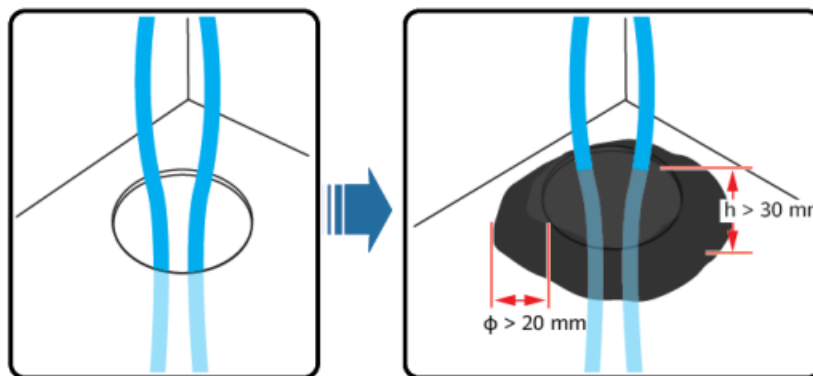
Standard for Sealing Construction of Wiring Holes
